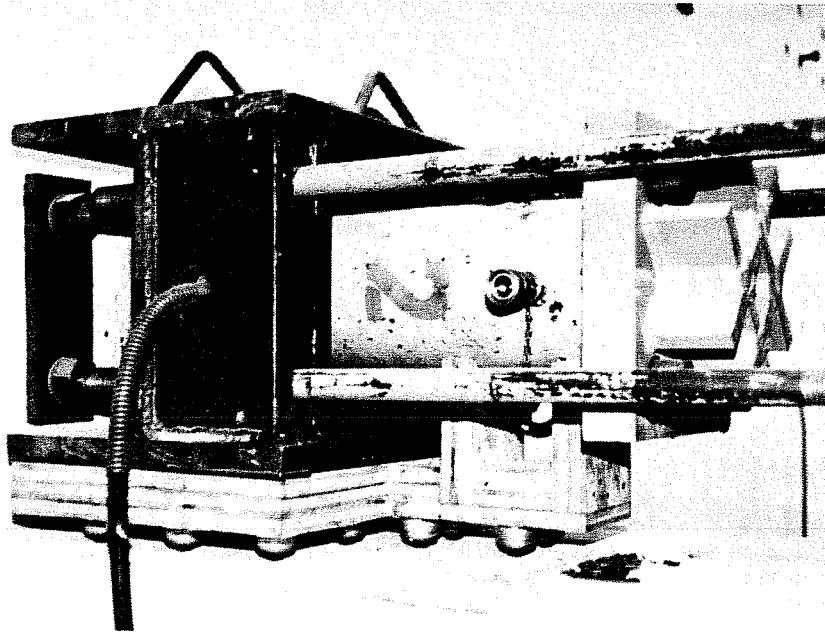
Roller Support for Horizontal Bearing Beam and Ram
